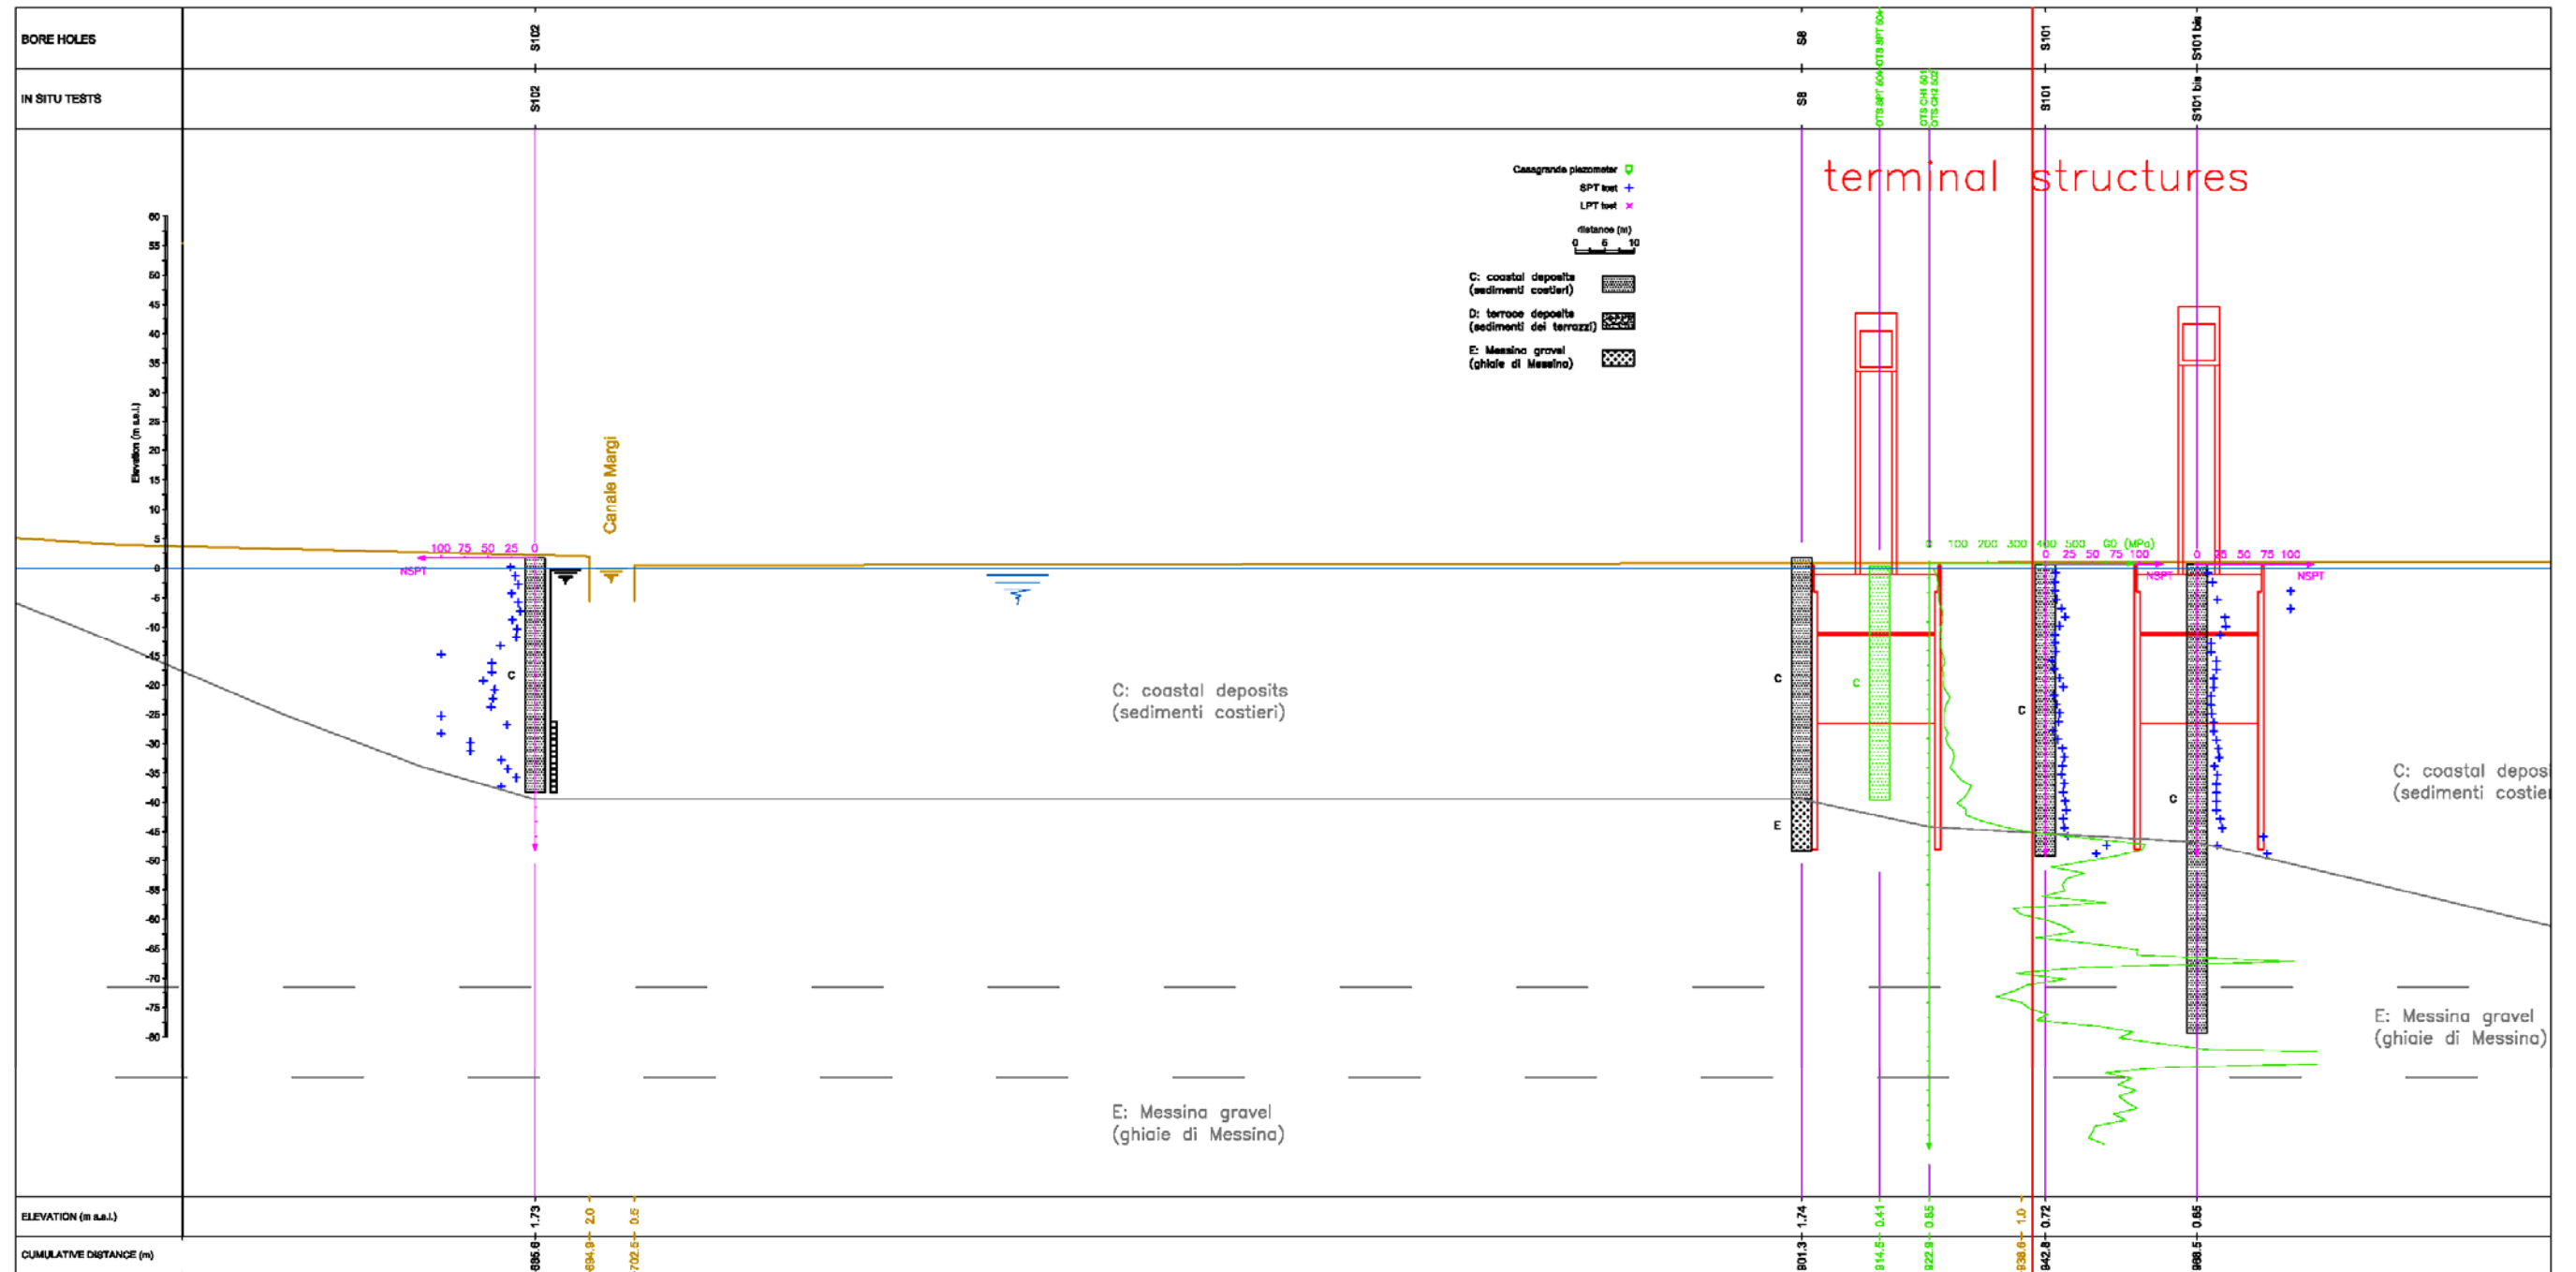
Sicilia shore - longitudinal section at the terminal structures
